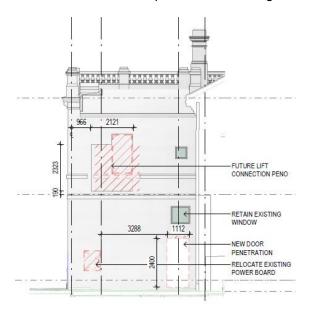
Eastern elevation existing (Source: Architectural Drawing No. AR-DA1-2000, Rev C)
